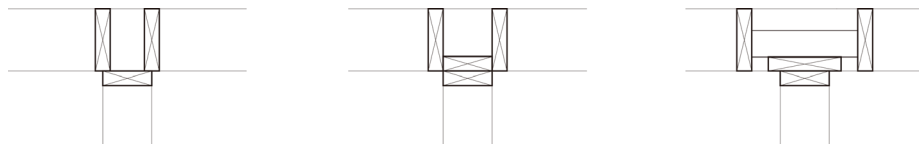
Plan of intersection studs, drawn by author (Ching, 2014)
